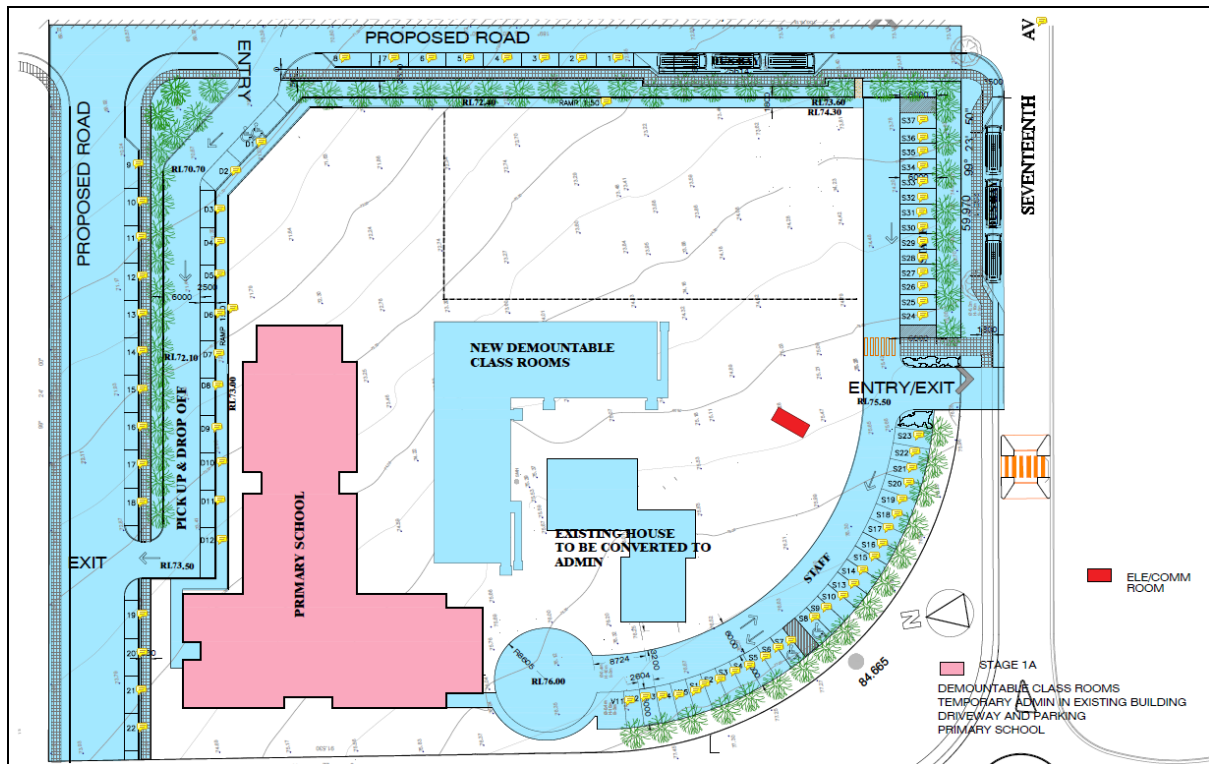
Extract of additional Stage 1A Site Plan (North to left)
